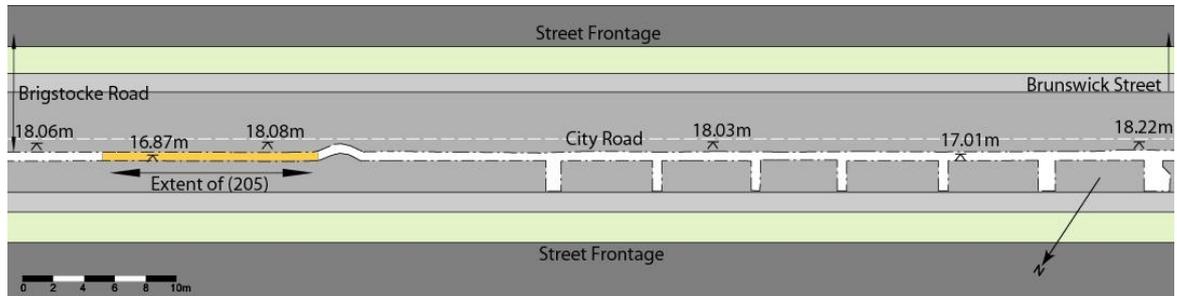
Plan of ground works on City Road between the junctions with Brunswick Street and Brigstocke Road
